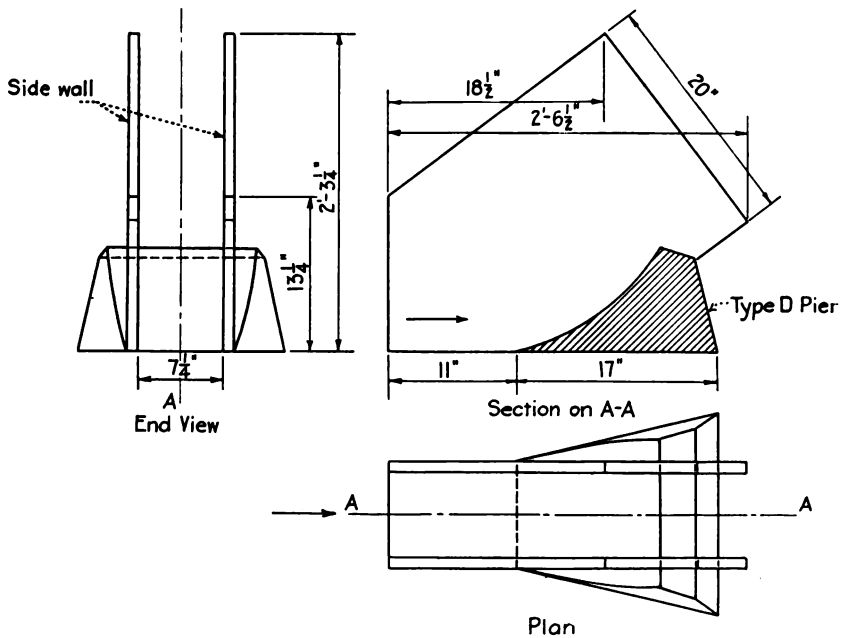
PLAN, ELEVATION, AND SECTION OF SPRAYING MODEL 1.
